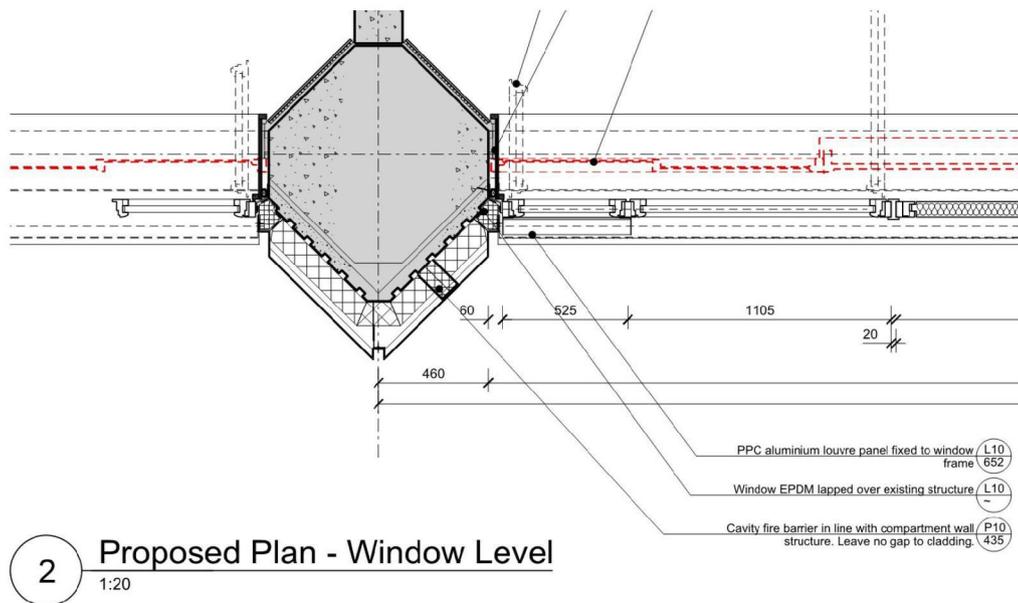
Extract from Studio E Drawing 1279 (06) 110 00 'Proposed Typical Bay Plans, Section & Elevation' {SEA00002499}
